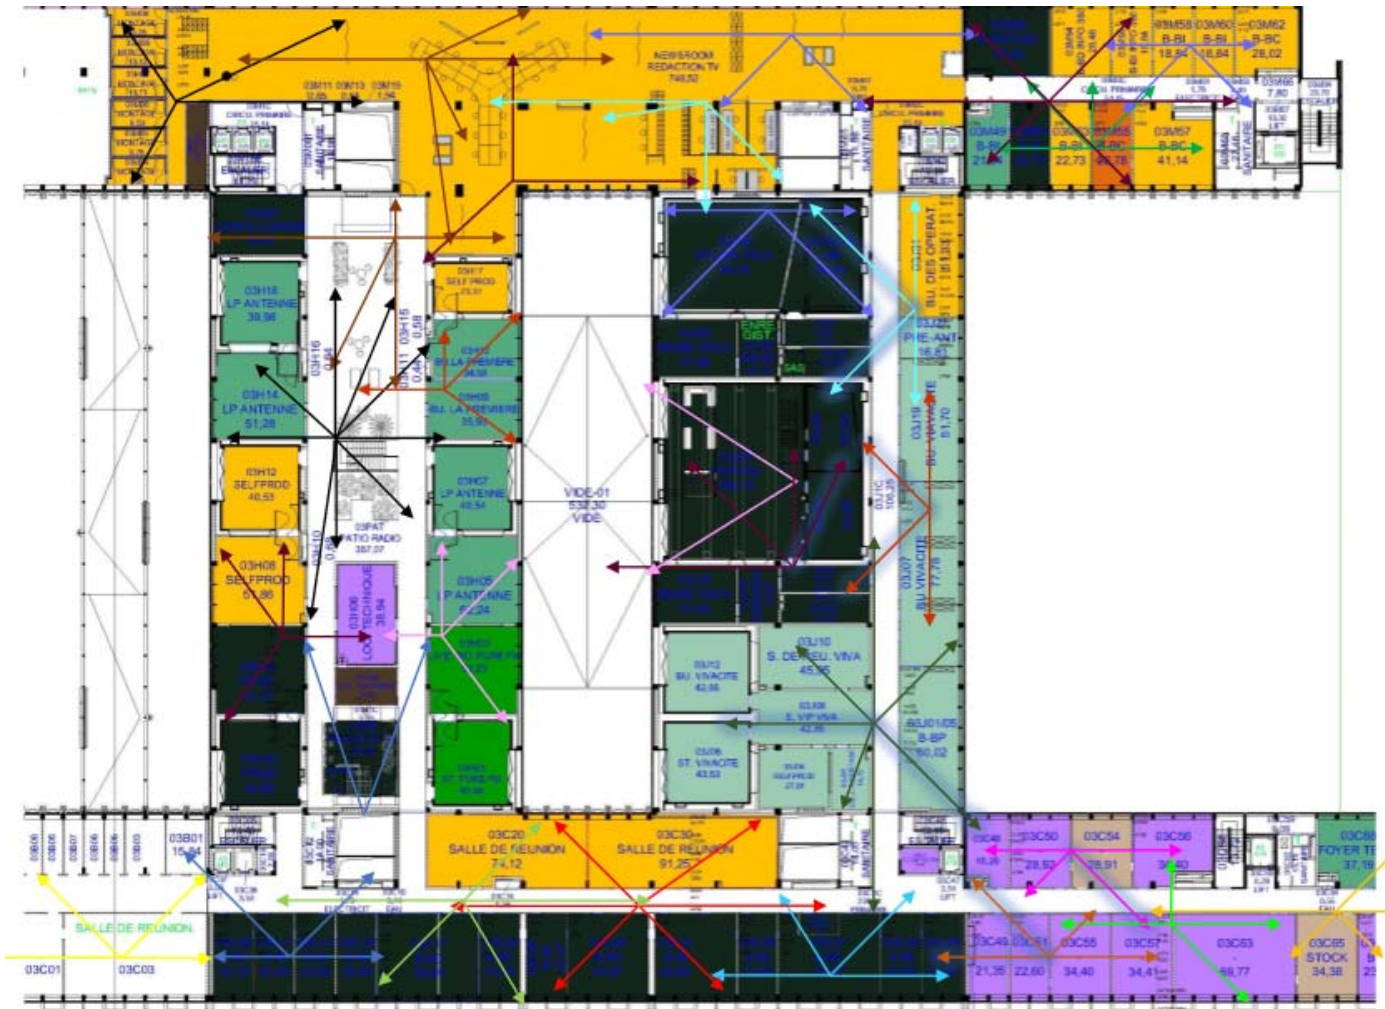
Design at 5 GHz for Floor 3 in Building PUVQ
